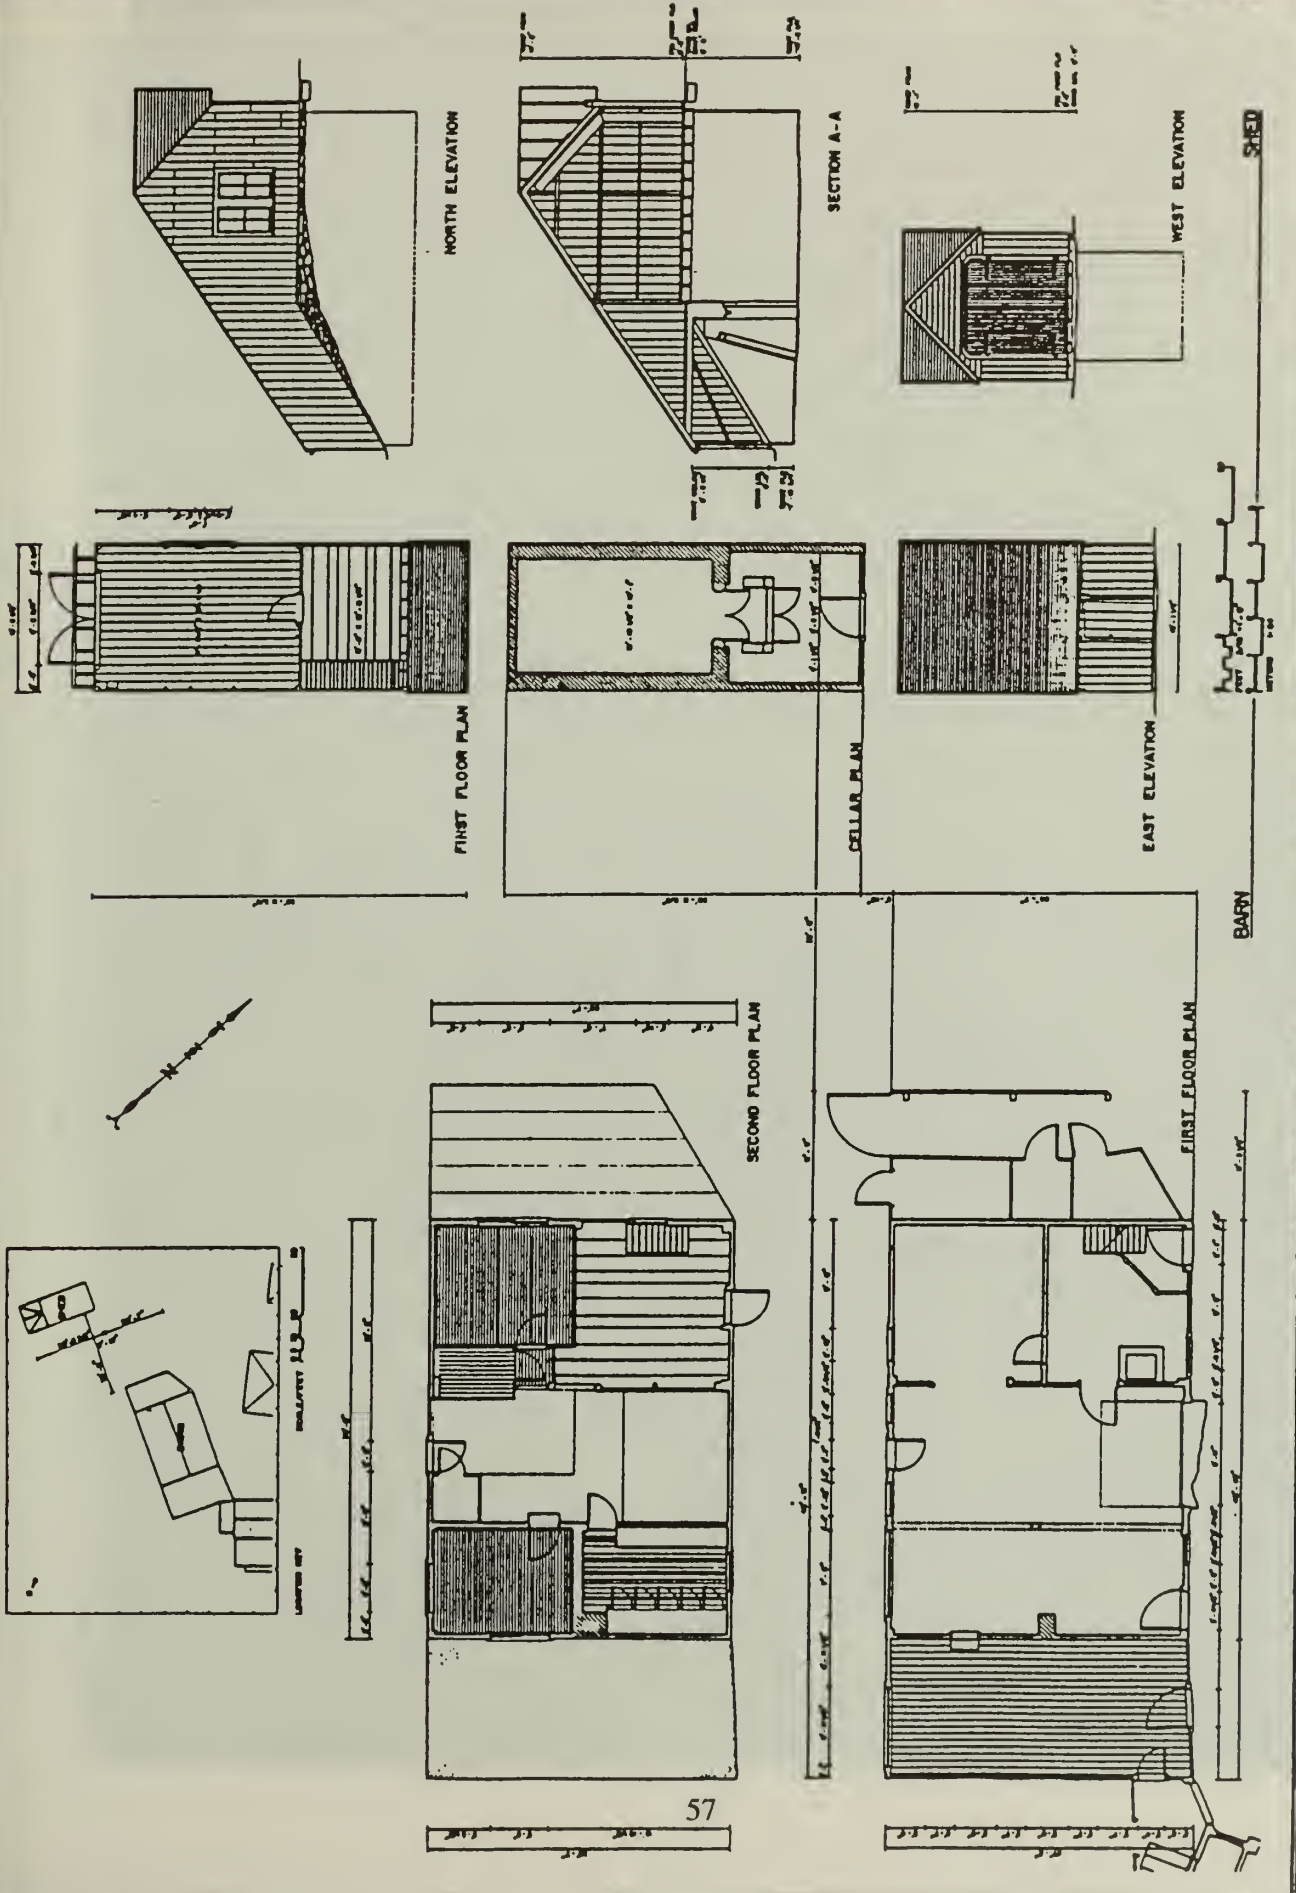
Plans, elevations, and sections for the shed (at right), 1982.
